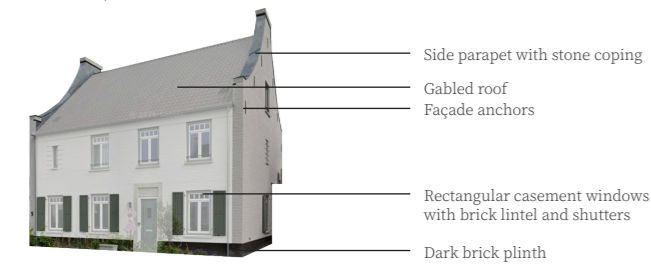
Engelbrechthoek 5 Brandevoort, showing side parapet, anchors and plinth (Google earth, 2026c, Brandevoort)
